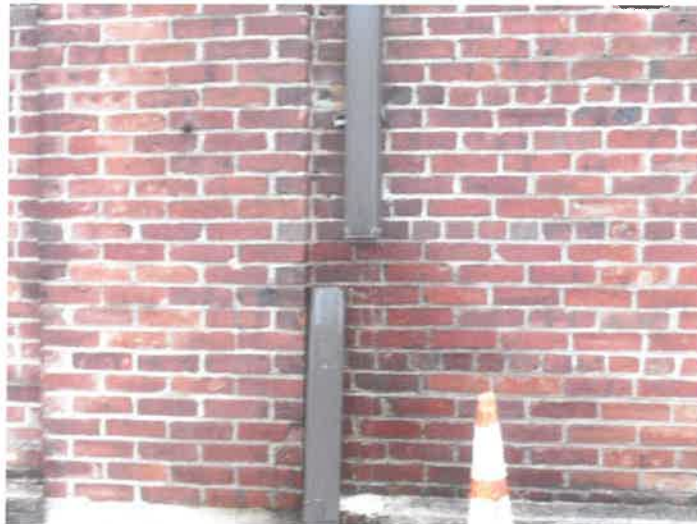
Detached Rain Leader (Downspout) at North Elevation
